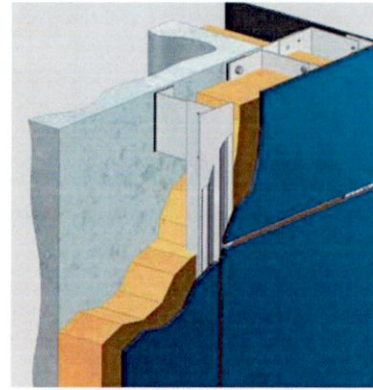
3d Visualisation of cladding panel arrangement and fixing detail
